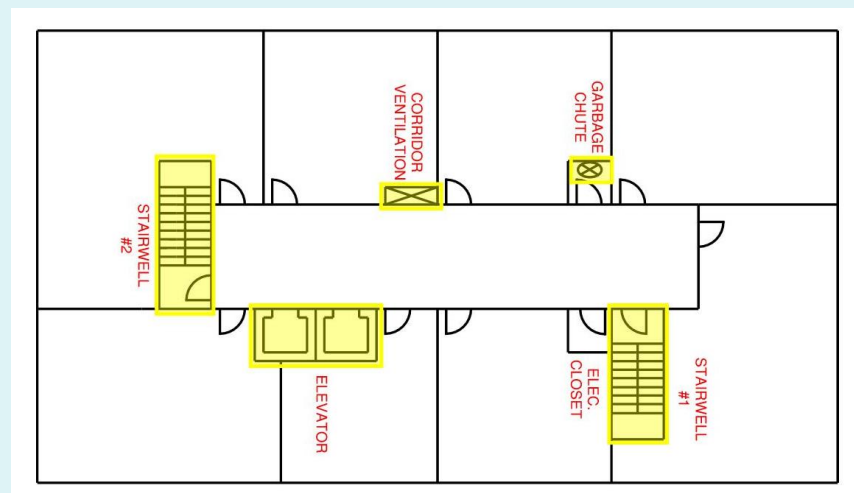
Example floor plan with zone by-passes highlighted in yellow
